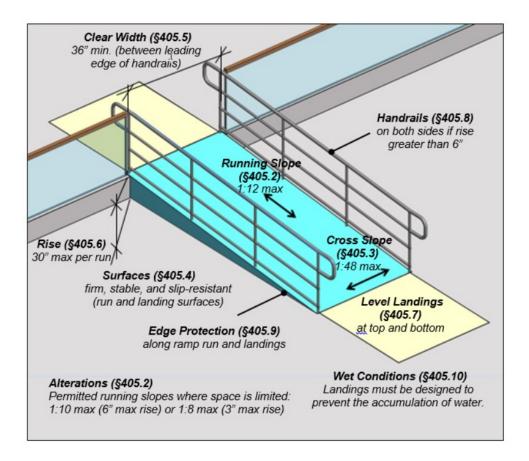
ADA Building Ramps Illustration, Source US Access Board and CFR
